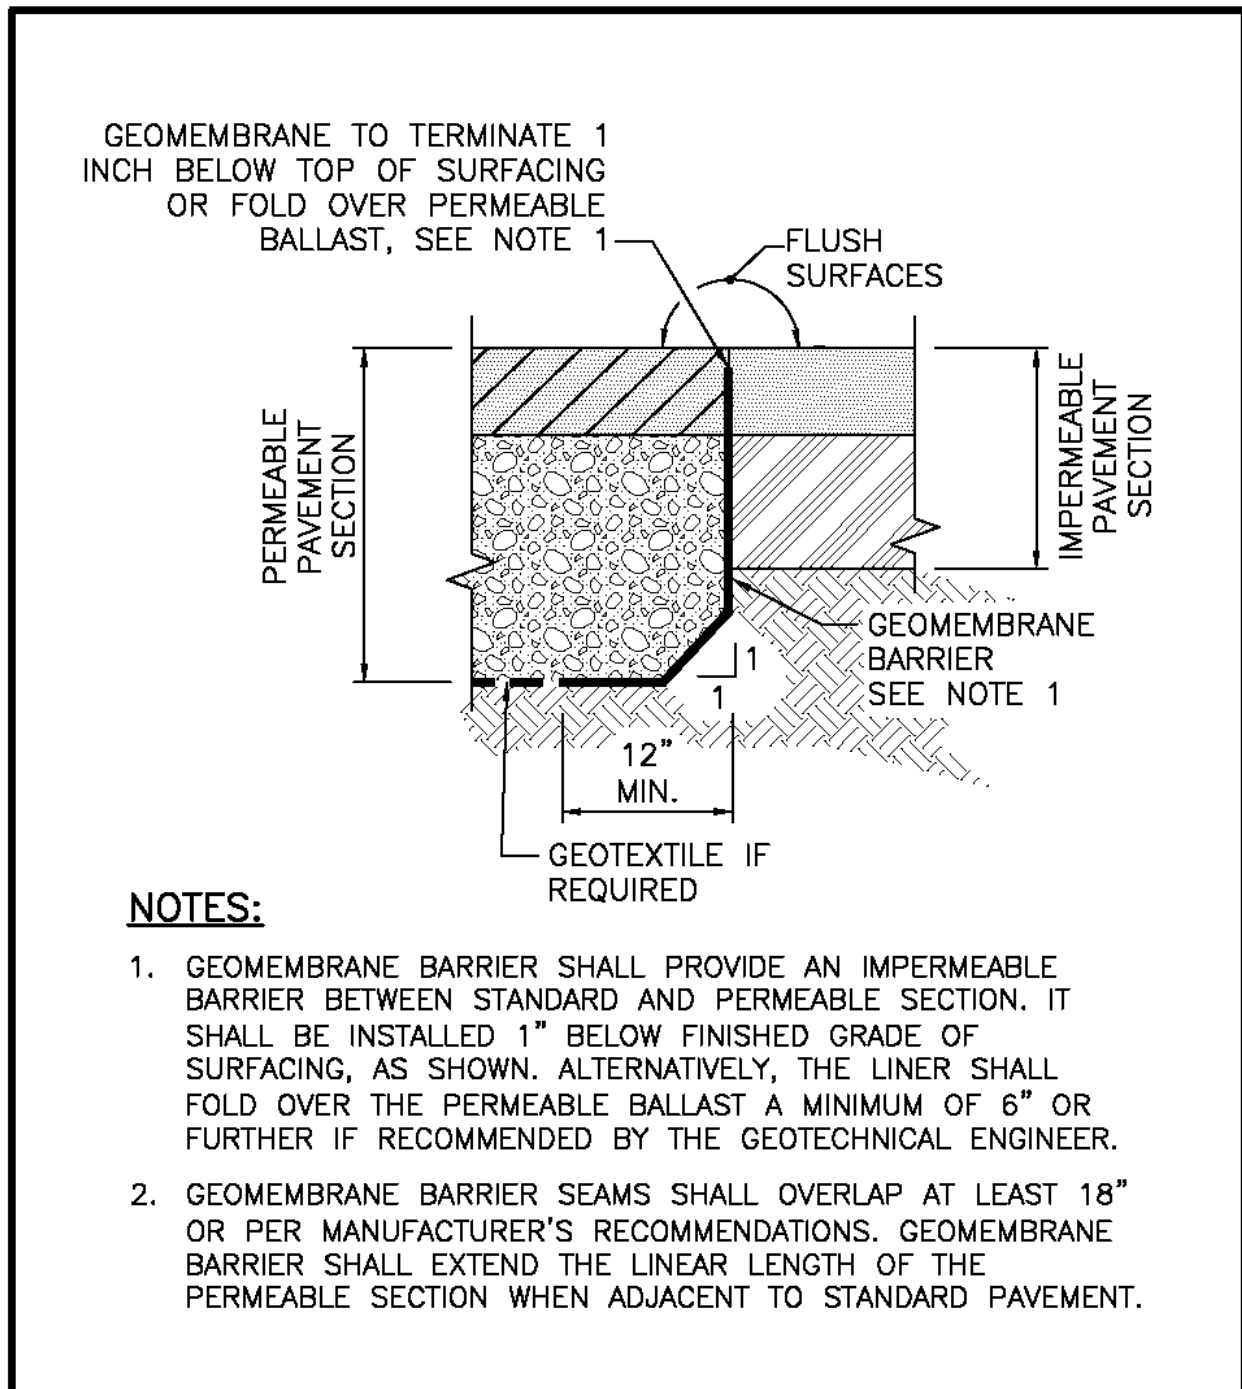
Example Permeable Pavement Geomembrane Edge Treatment.
